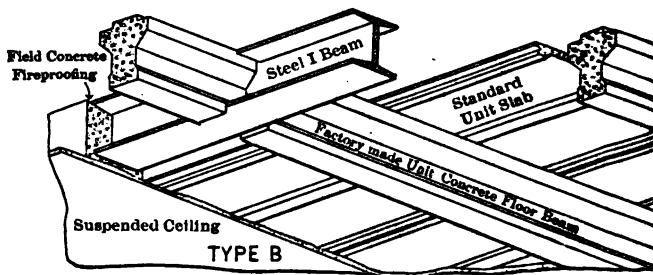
Watson Reinforced-concrete Floor-construction. With Slabs
